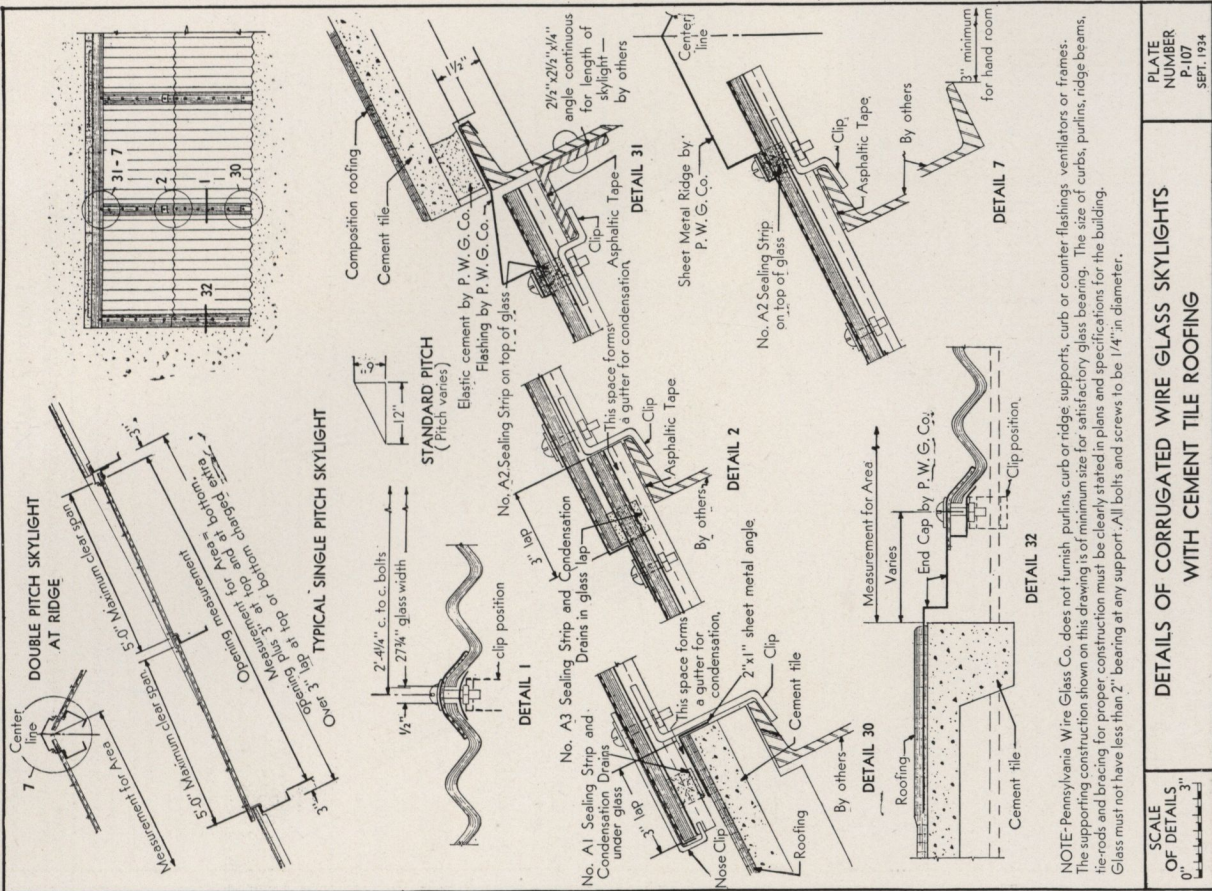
DETAILS OF CORRUGATED WIRE GLASS SKYLIGHTS
